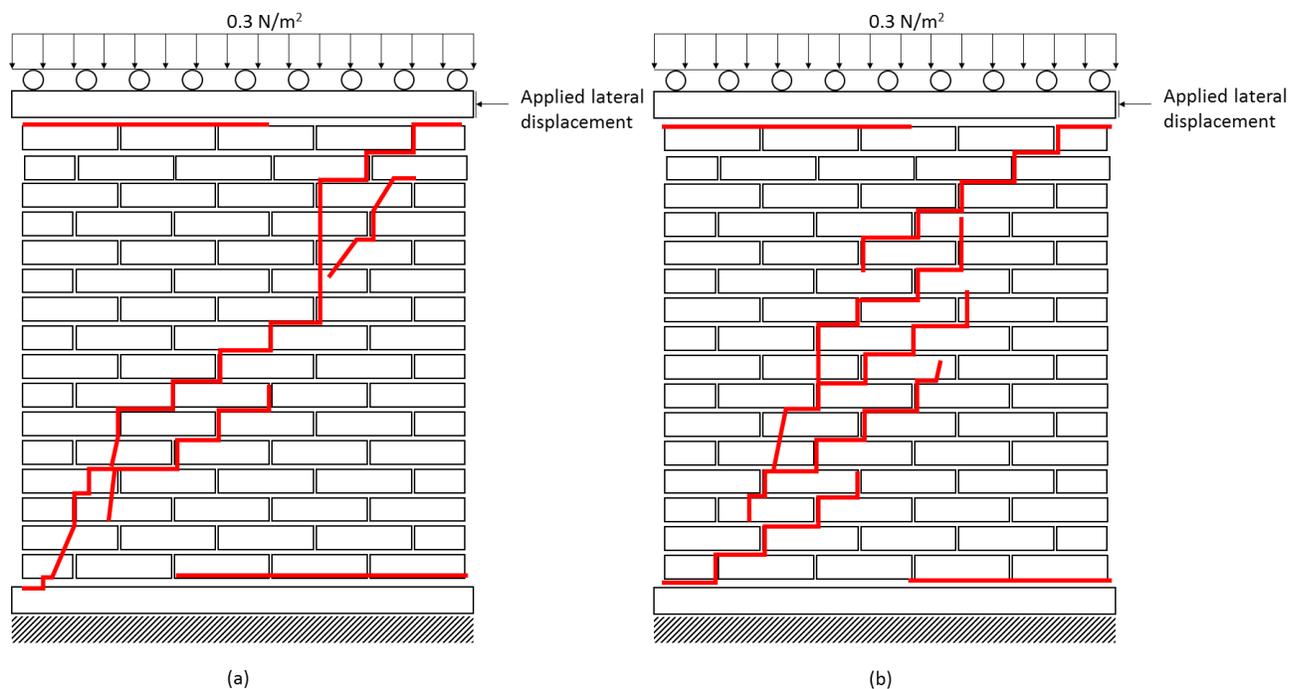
Crack patterns at 4mm of laterally applied displacement, for experimentally tested shear walls: (a) test specimen 1 (b) test specimen 2 (Lourenco, 1996)
